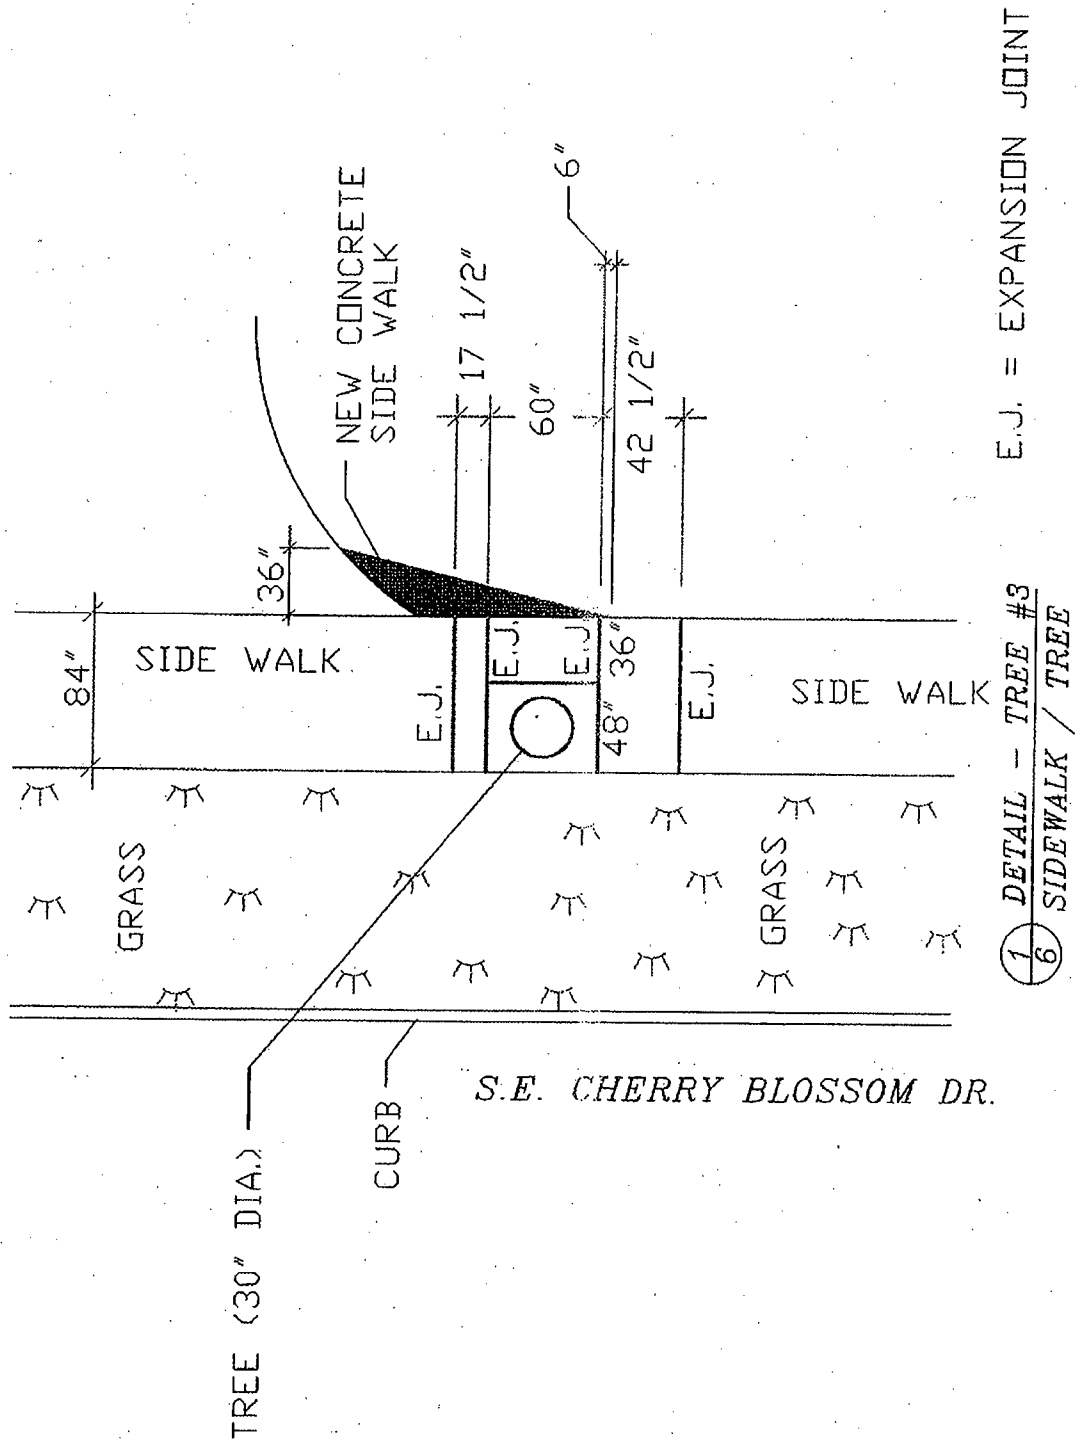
" SIDEWALK EAST OF BUILDING ENTRANCE
